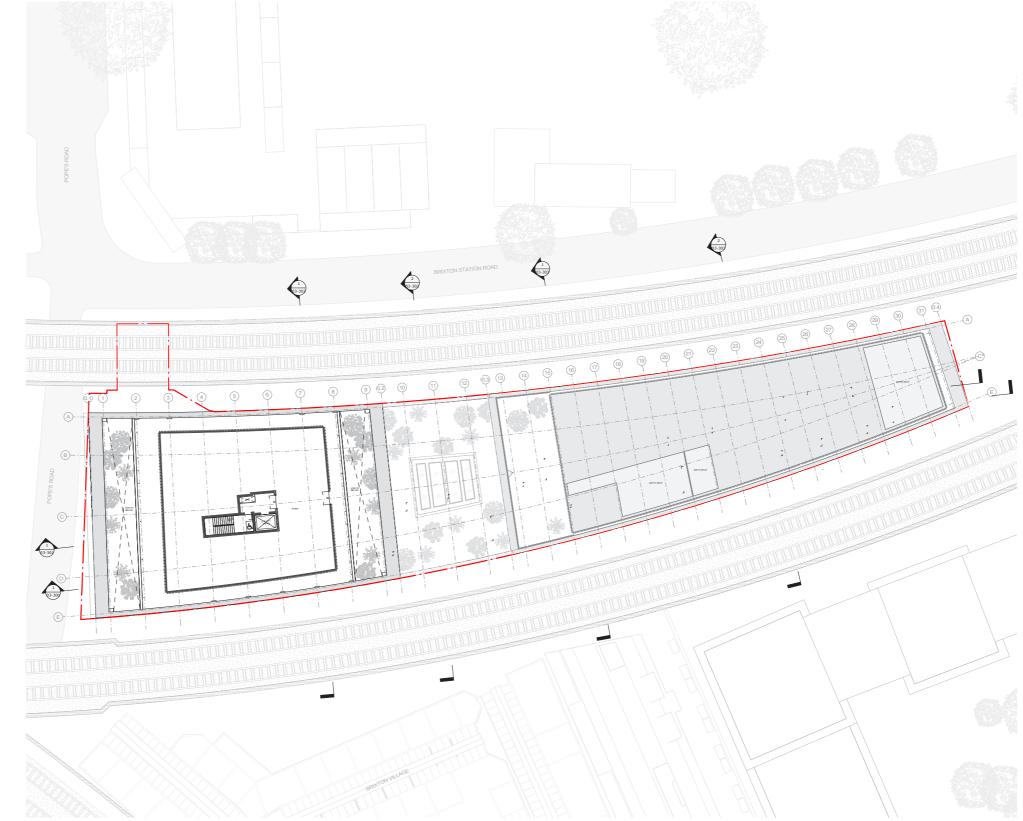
Fifteenth, seventeenth and nineteenth floor plan
